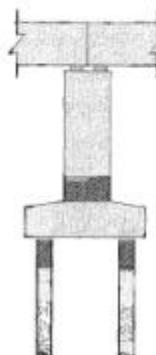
Schematic of Potential Damage Region of Pier
